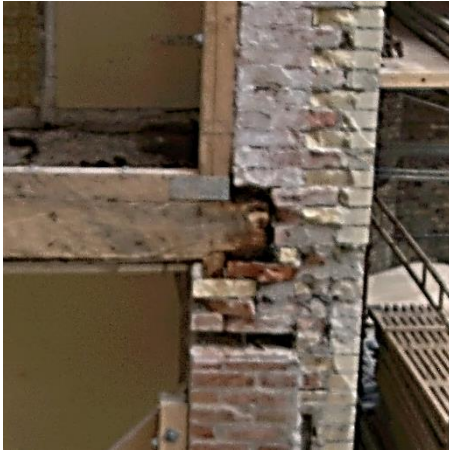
Facade/wooden beam interaction, ground floor (2½ bricks) --> 1st floor (2 bricks).
